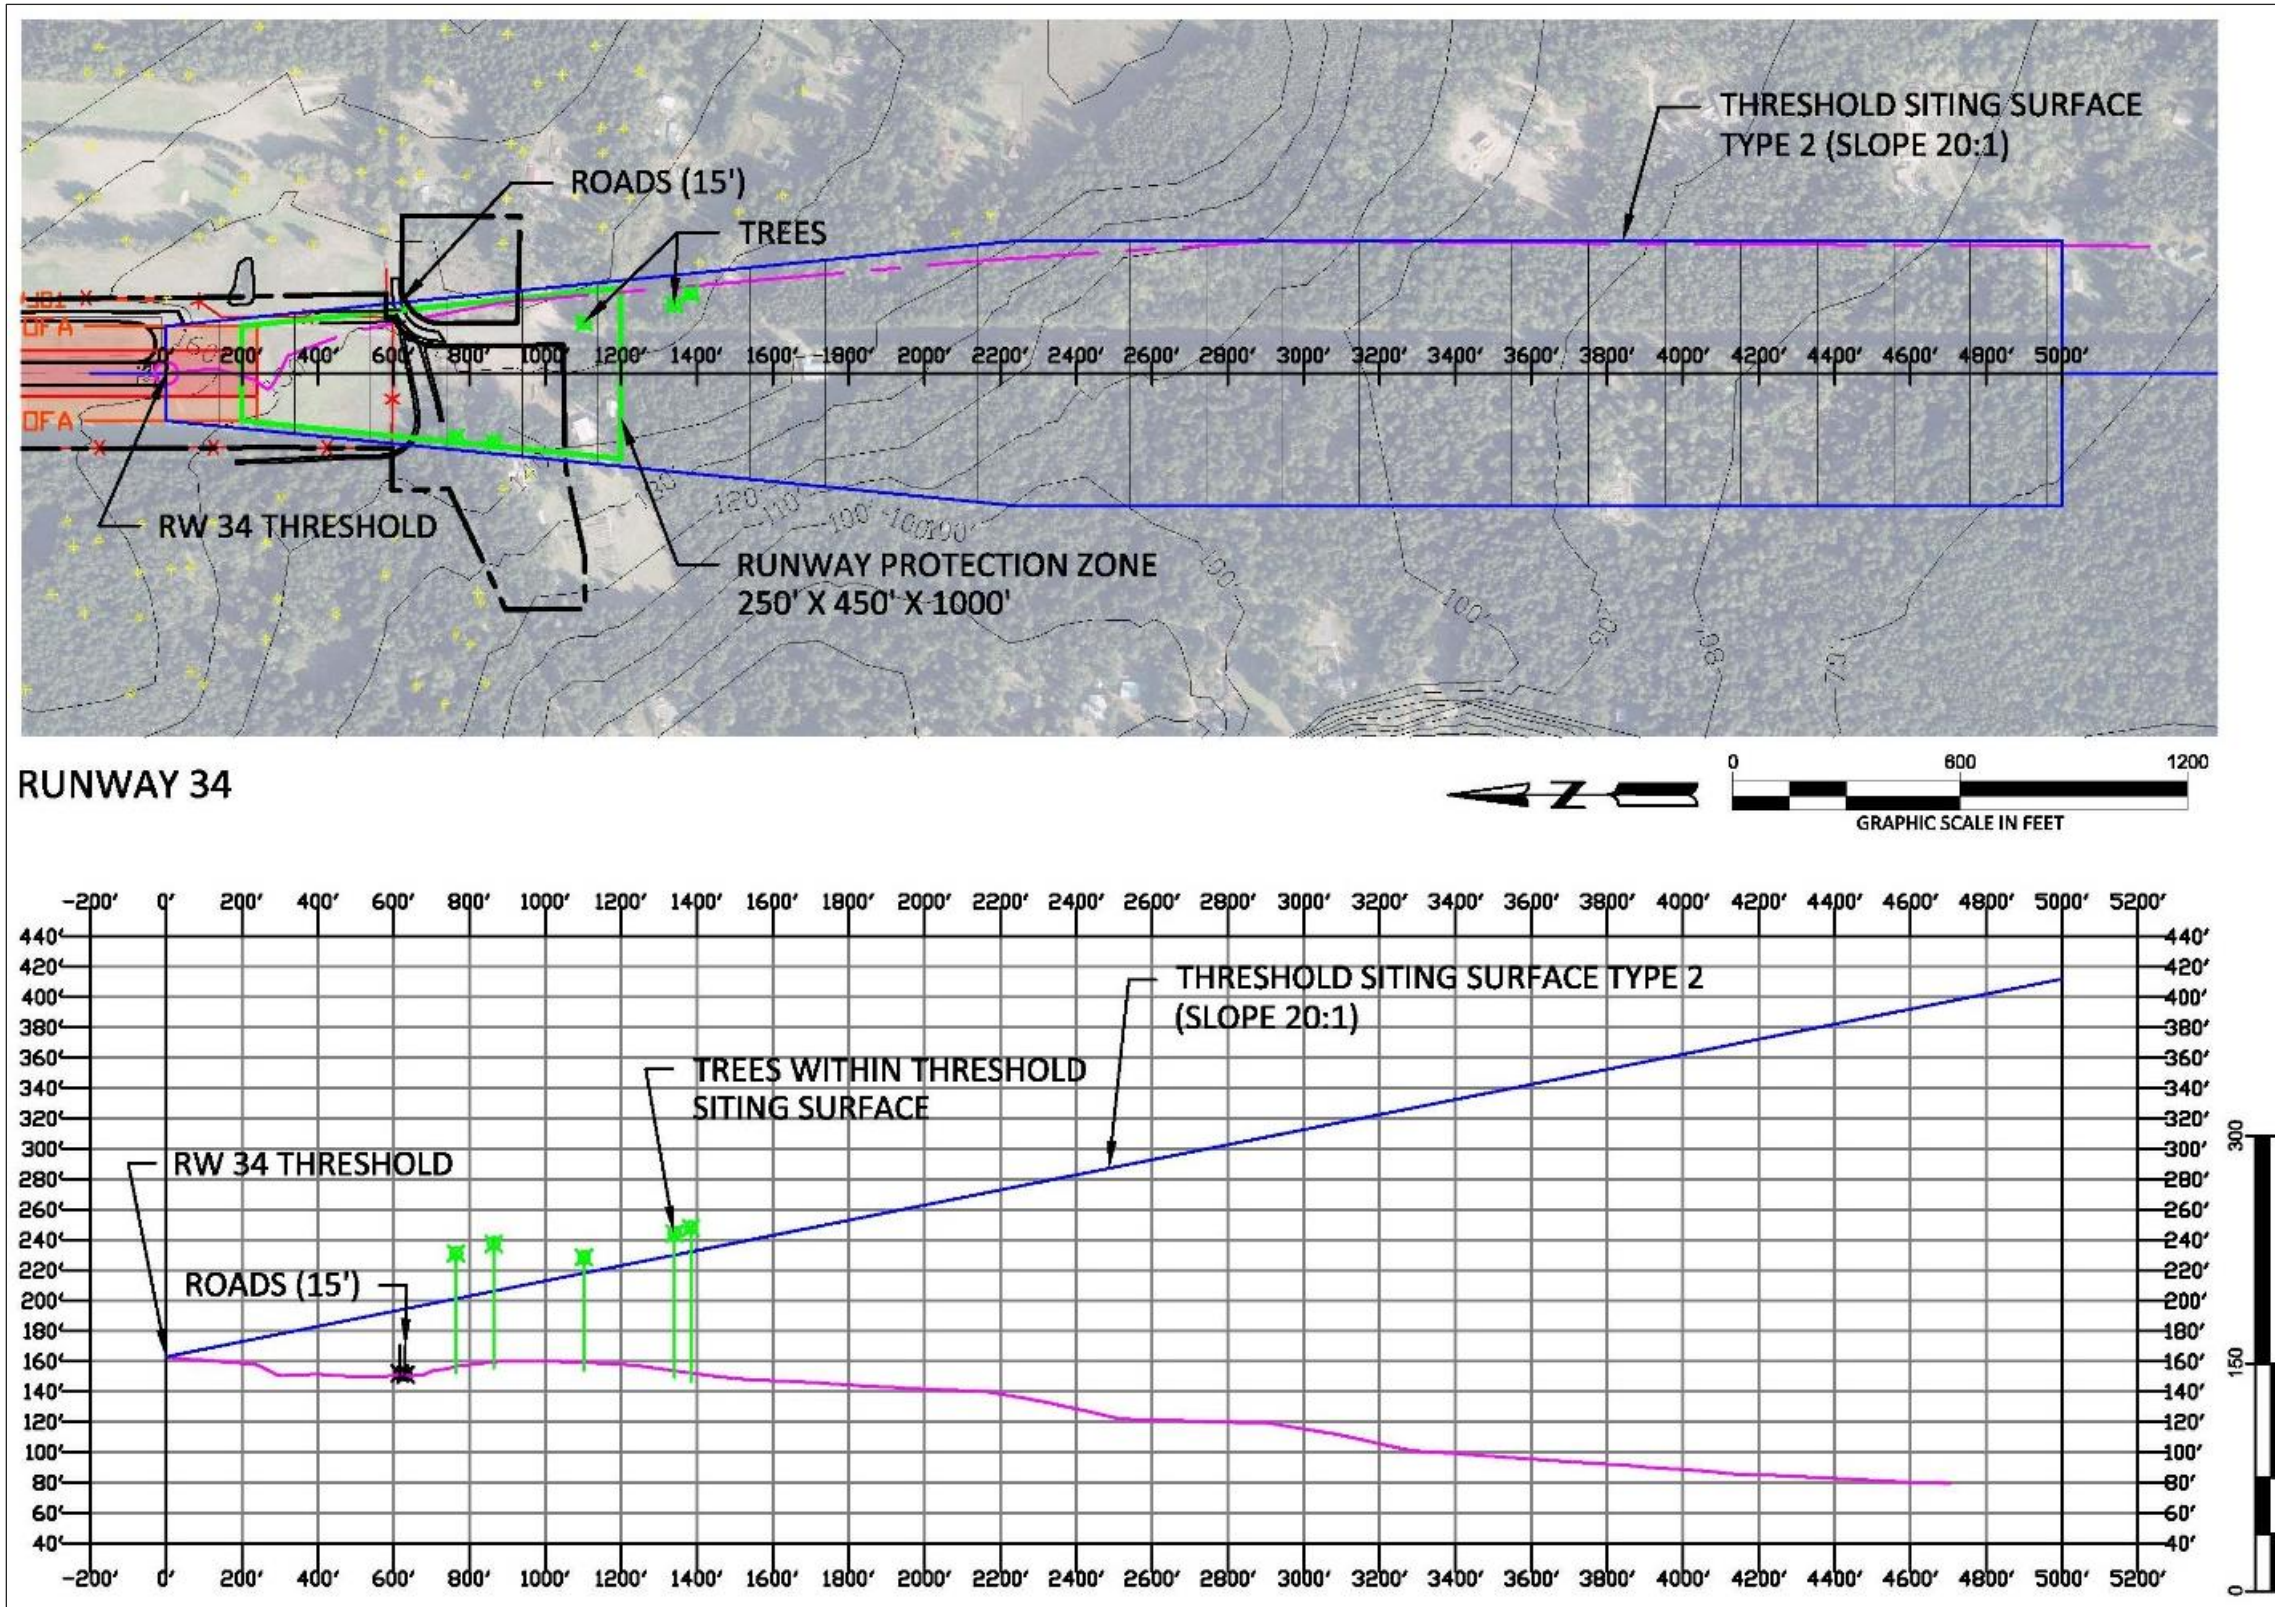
Runway 34 Threshold Siting Surface, Plan and Profile
